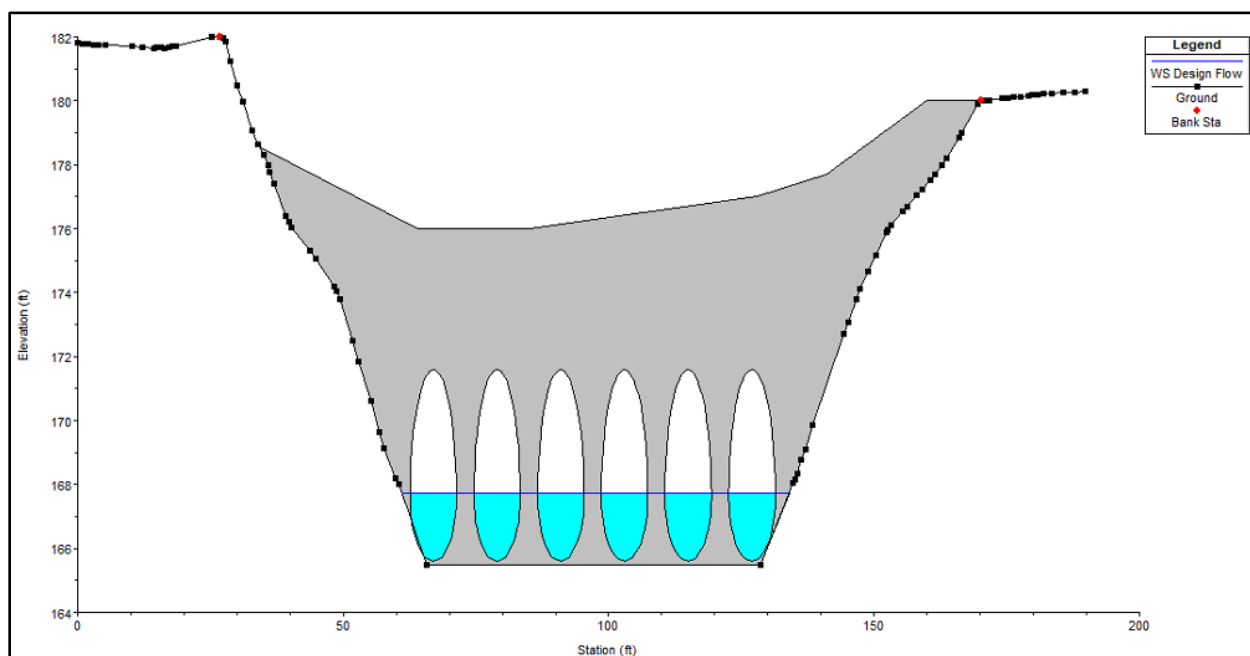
Section View of Delta-Mendota Canal Crossing (facing downstream)
